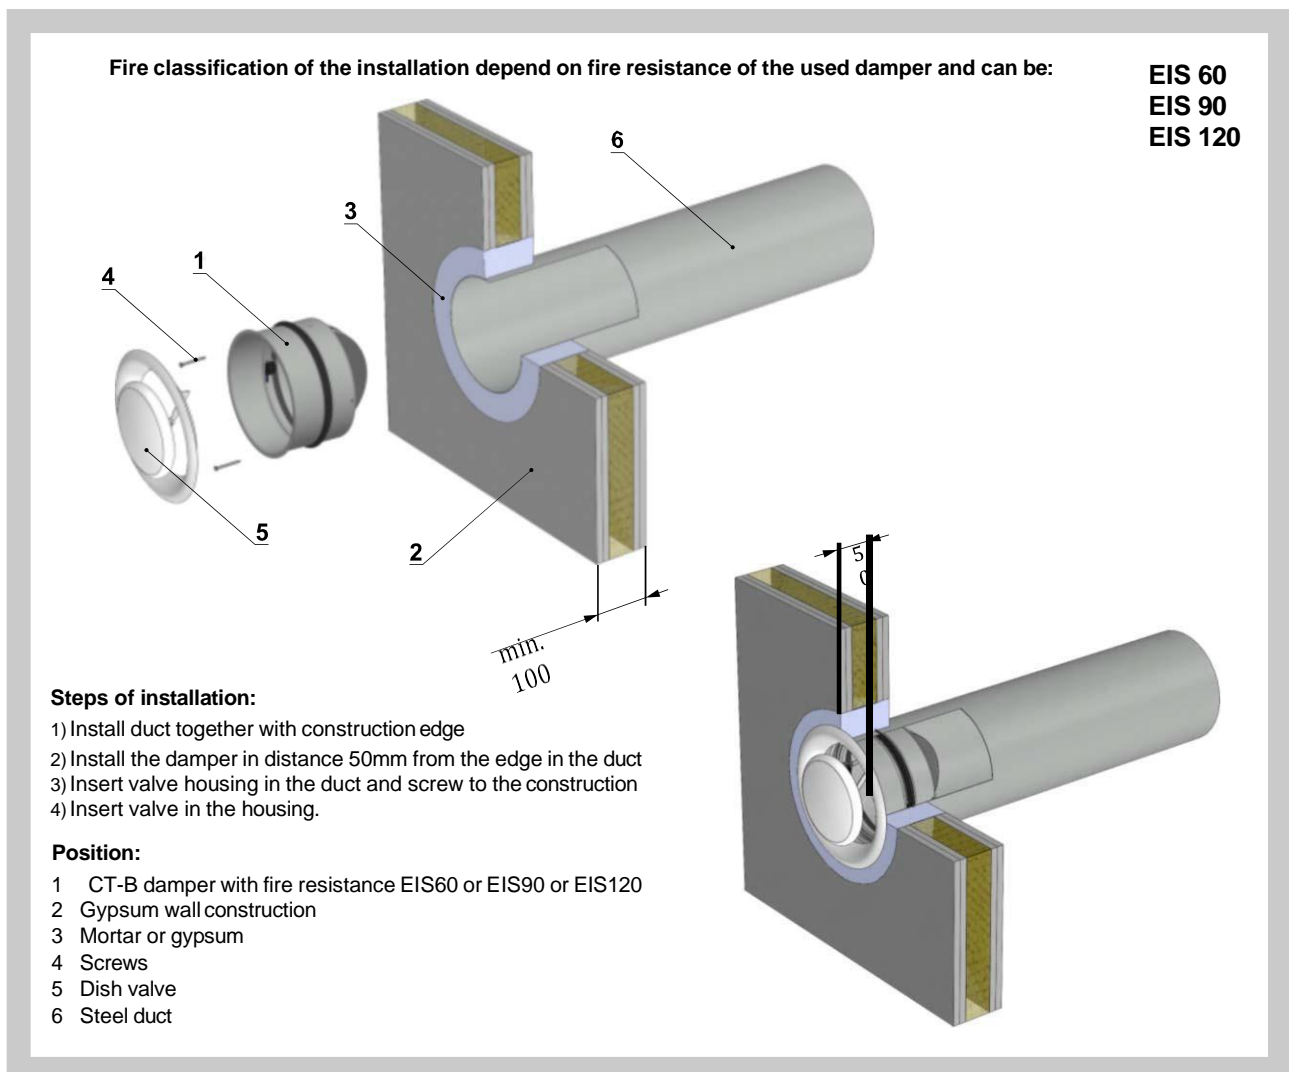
Installation of the CT-B damper with dish valve in gypsum wall construction
